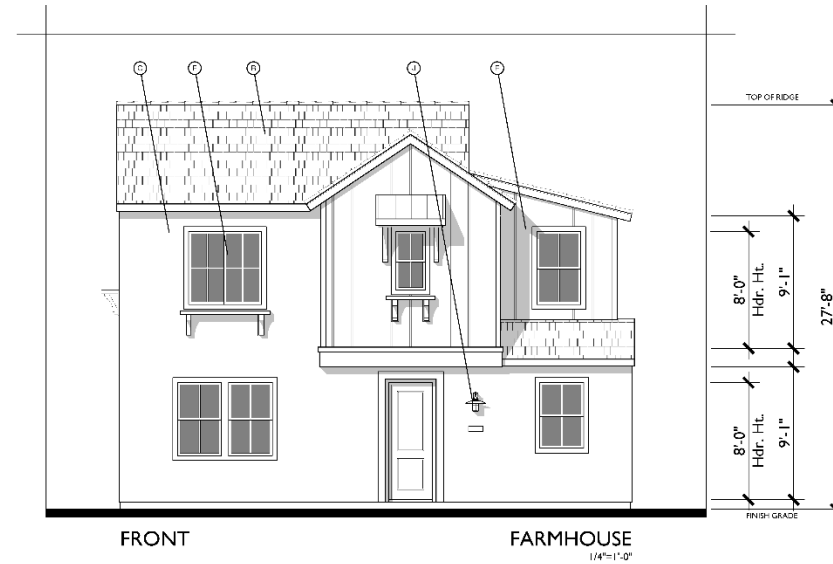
Farmhouse Elevation - Cluster Plan 3
